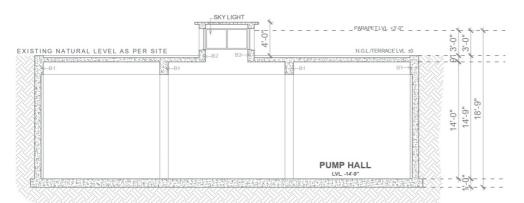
Proposed Section A-A of the HVAC structures near the Secretariat Building © Engineering Department Union Territory Chandigarh
